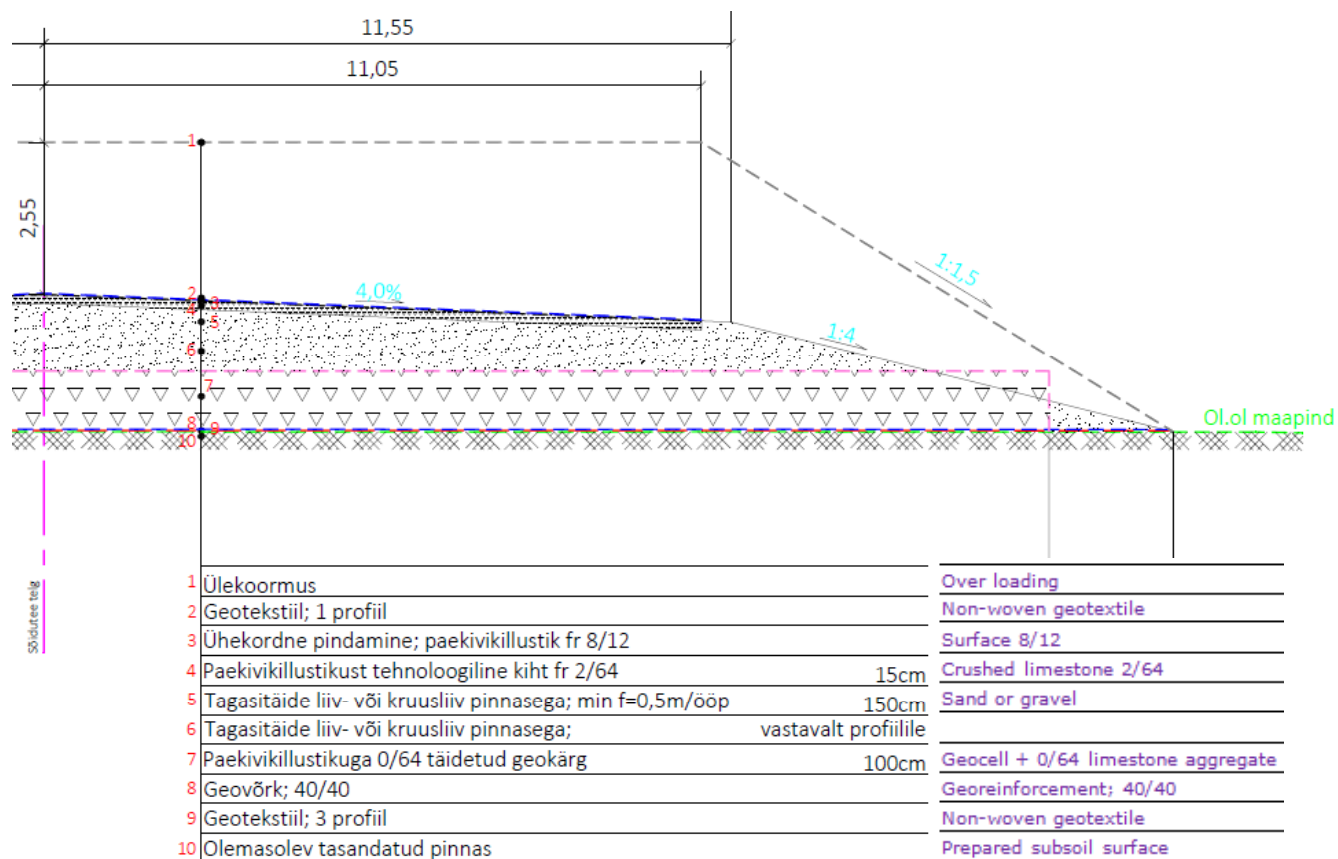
Cross-section of test section 3. Geocell-structure (1m) on top of georeinforcement.
